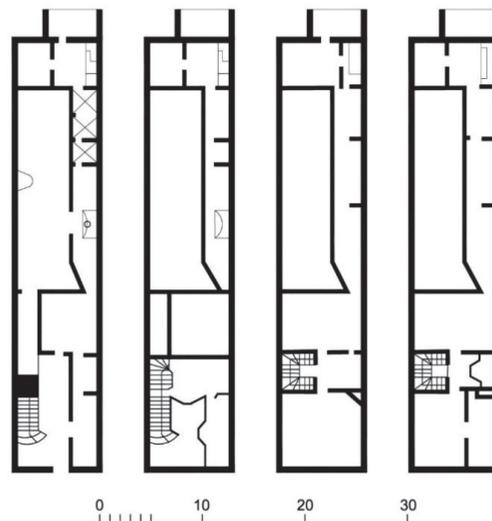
Uphagen House, Gdańsk, 12 Długa Street, ground floor plans, mezzanine, first and second floors [39].
